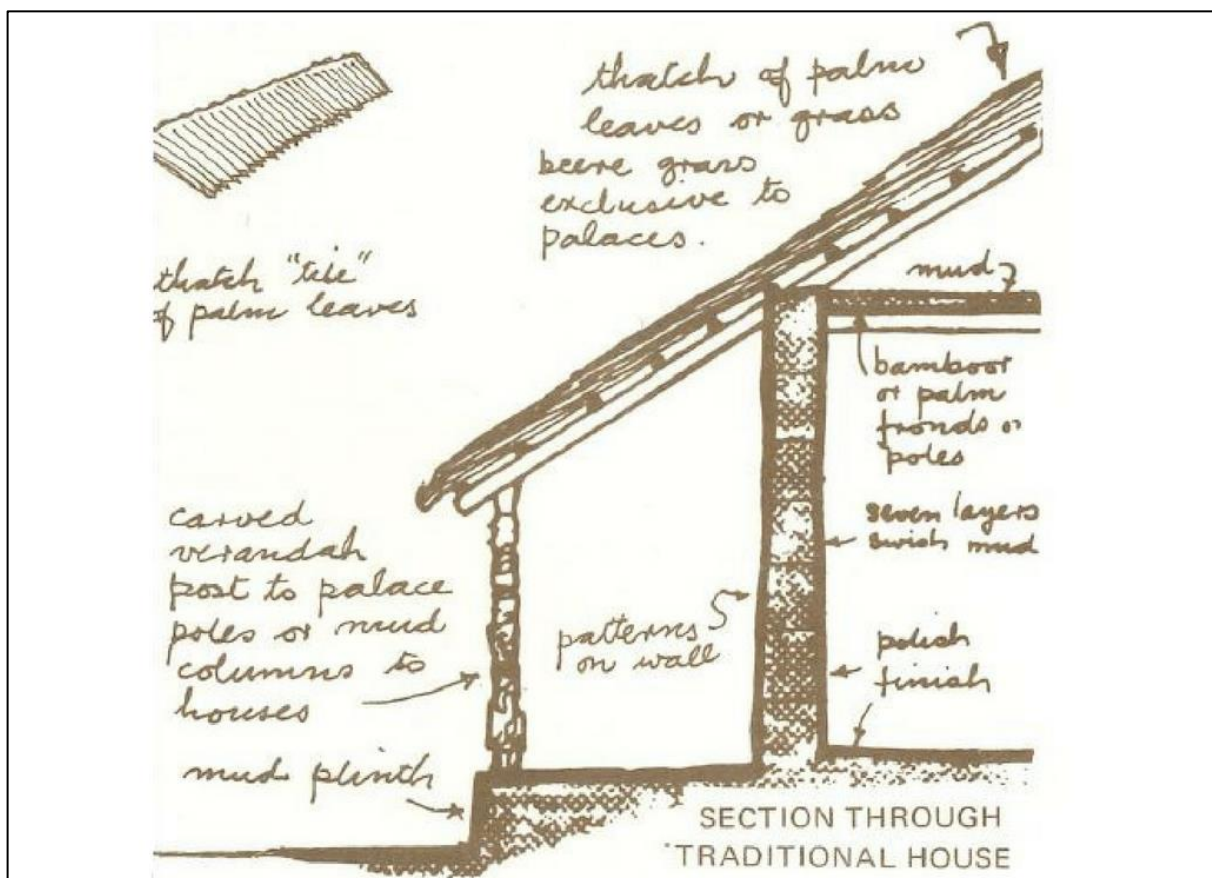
Section through traditional house showing typical construction – thatch roof on timber frame, mud walls and floors; source: Akinsemoyin & Vaughan-Richards (1977).
